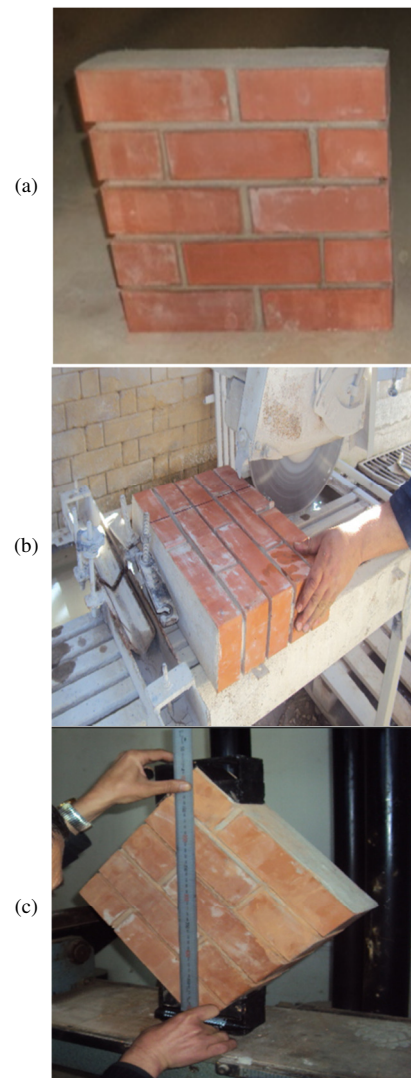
Wallet masonry specimen: (a) initial manufactured wallet 290mm x 420 mm, (b) cutting with marble saw, and (c) square specimen 290 cm x 290cm.
